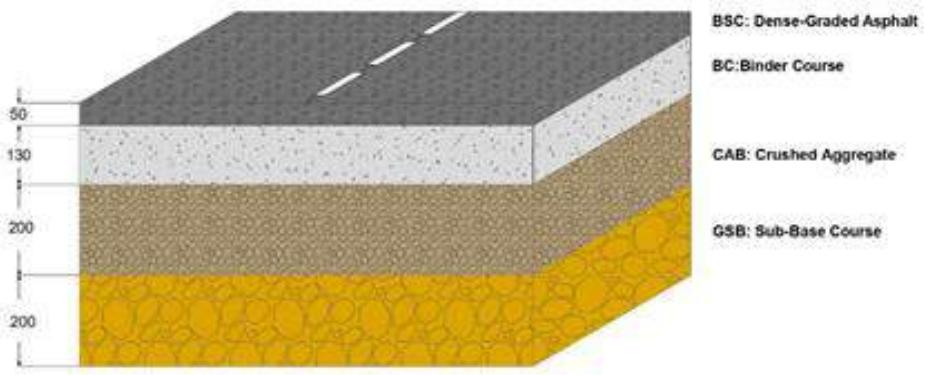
c) Pavement Structural Thickness Layout for T3
